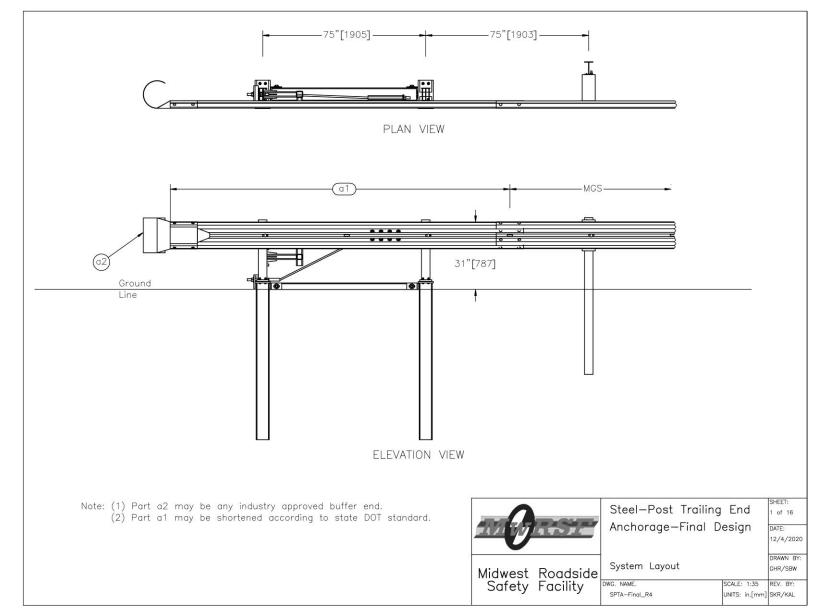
Steel-Post Trailing End Anchorage, System Layout
